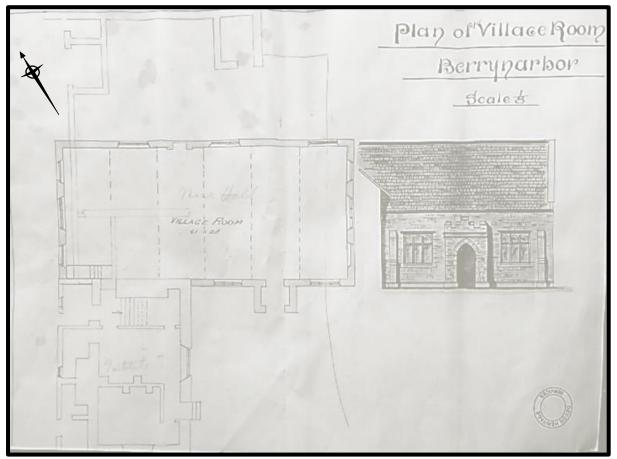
Plan and elevation of the Village Room dating from 1909 (North Devon Record Office B170-1/184) showing the new Manor Hall on the site of demolished parts of the house.
